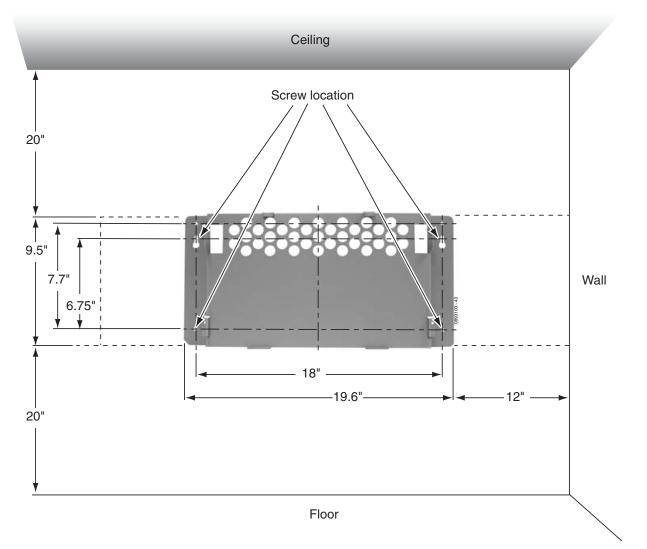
INSTALLING THE MOUNTING BRACKET
